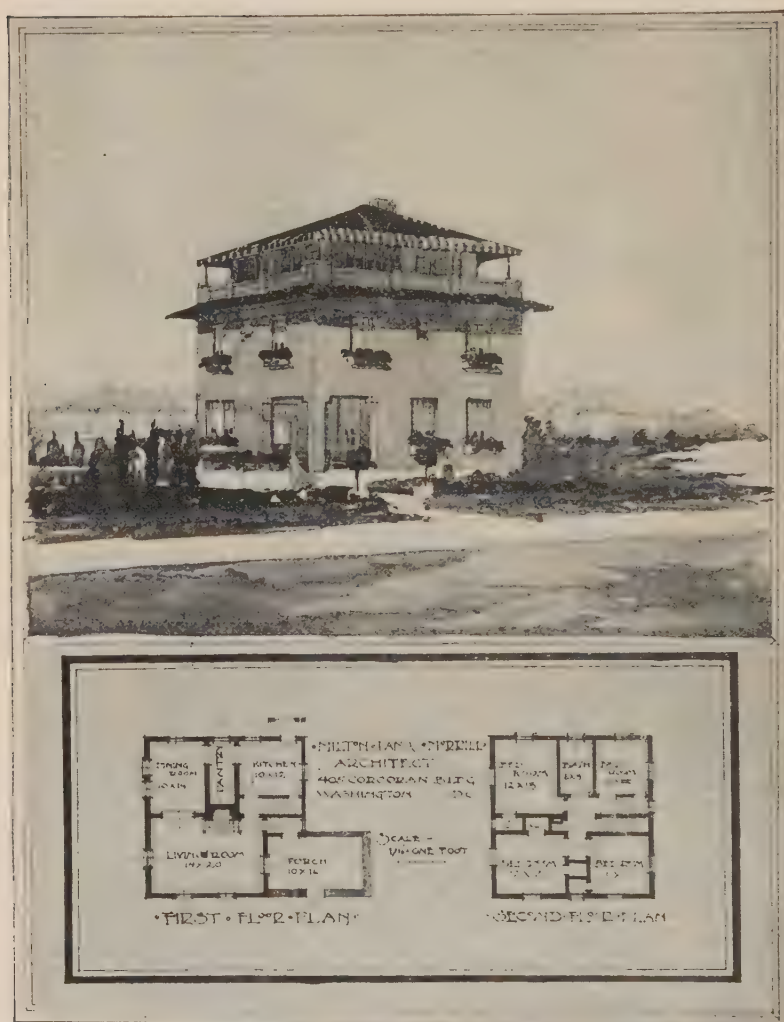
DESIGN FOR A SEVEN-ROOM CONCRETE HOUSE WITH ROOF GARDEN.
